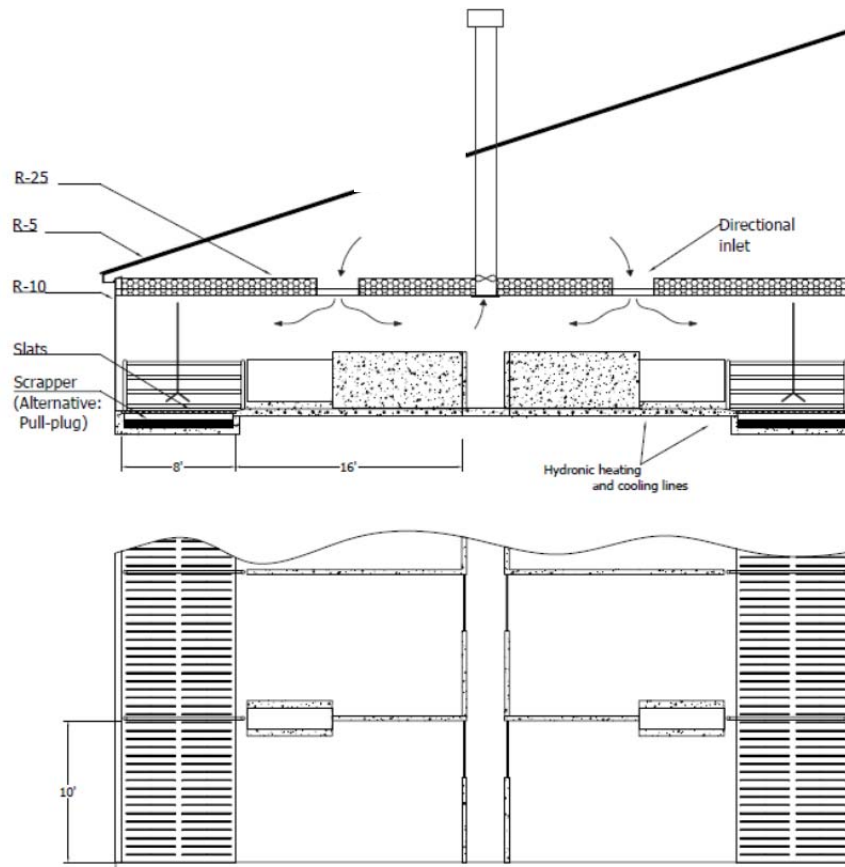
Half section and plan view of GPB A and B, partial slat barns.
